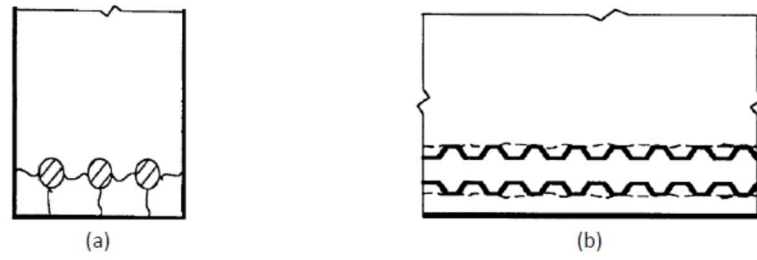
Bond failure modes: (a) End view showing splitting cracks between bar and concrete (b) Side view of member showing shear crack and/or concrete crushing due to pull-out (ACI, 2003).
